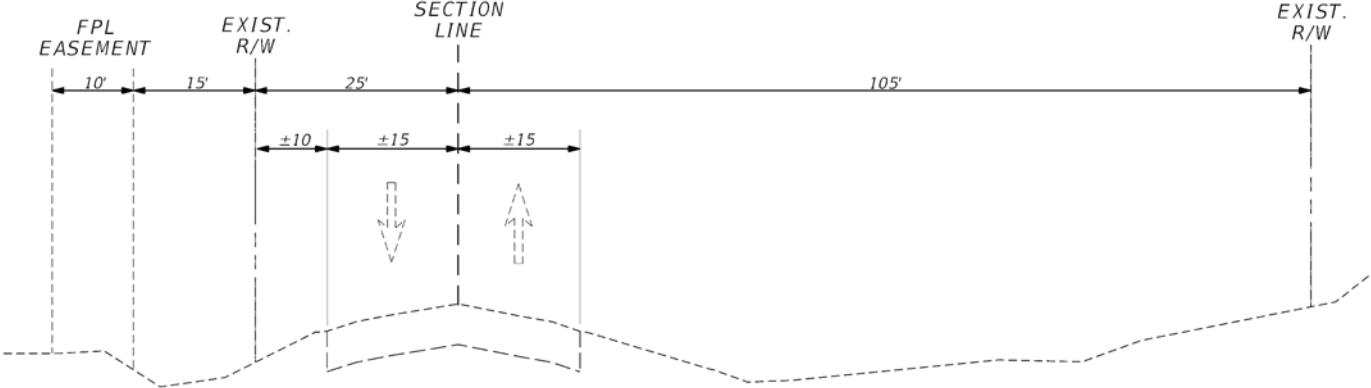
B: 58th Avenue Typical Section – North of 49th Street
